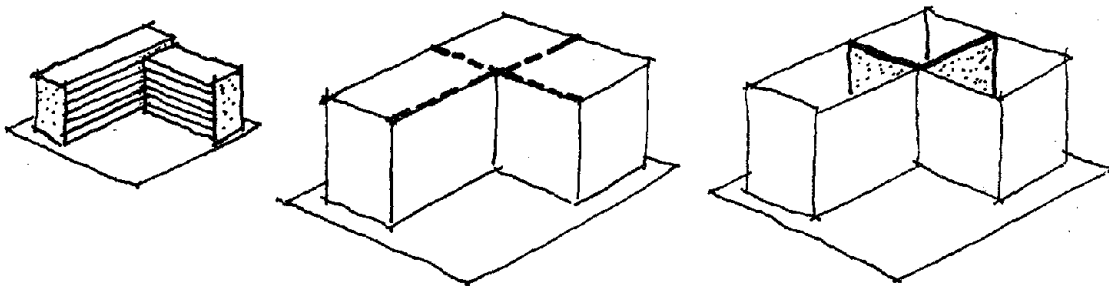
Building separation, or tying the building securely together with beam-like collectors or walls.
